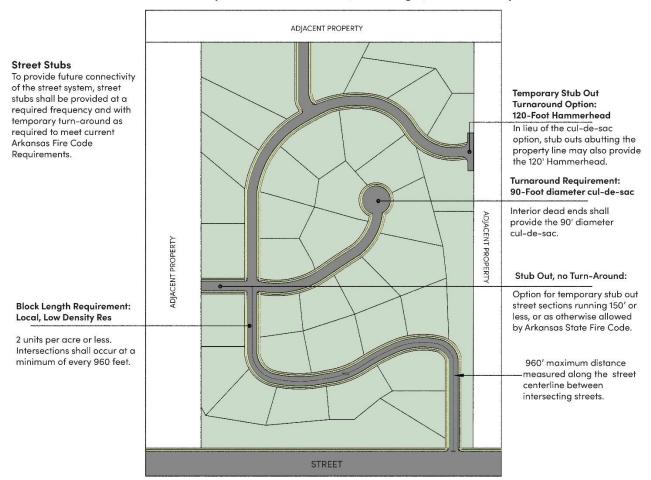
(B): Low Density Alternative -- Street Intersection, Block Length, and Stub Out Options
